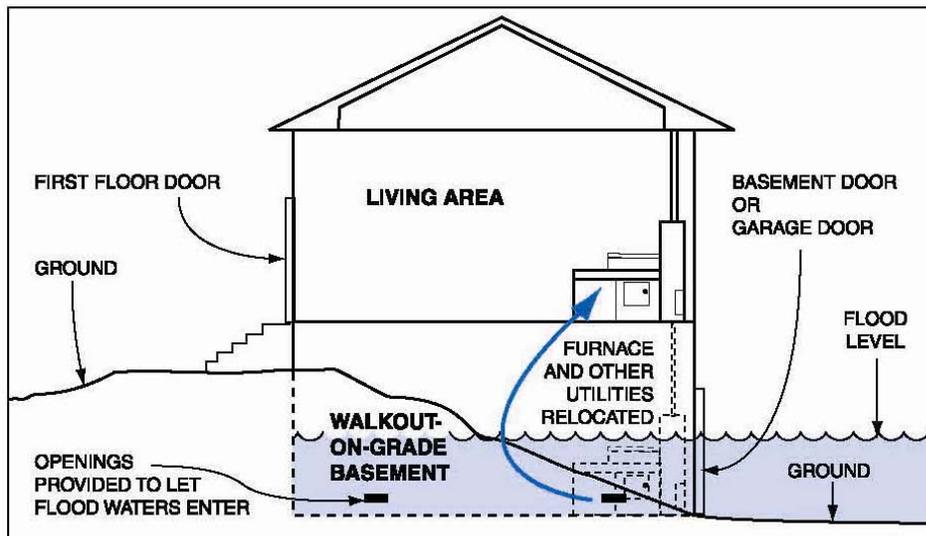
A structure with a wet floodproofed walkout-on-grade basement
